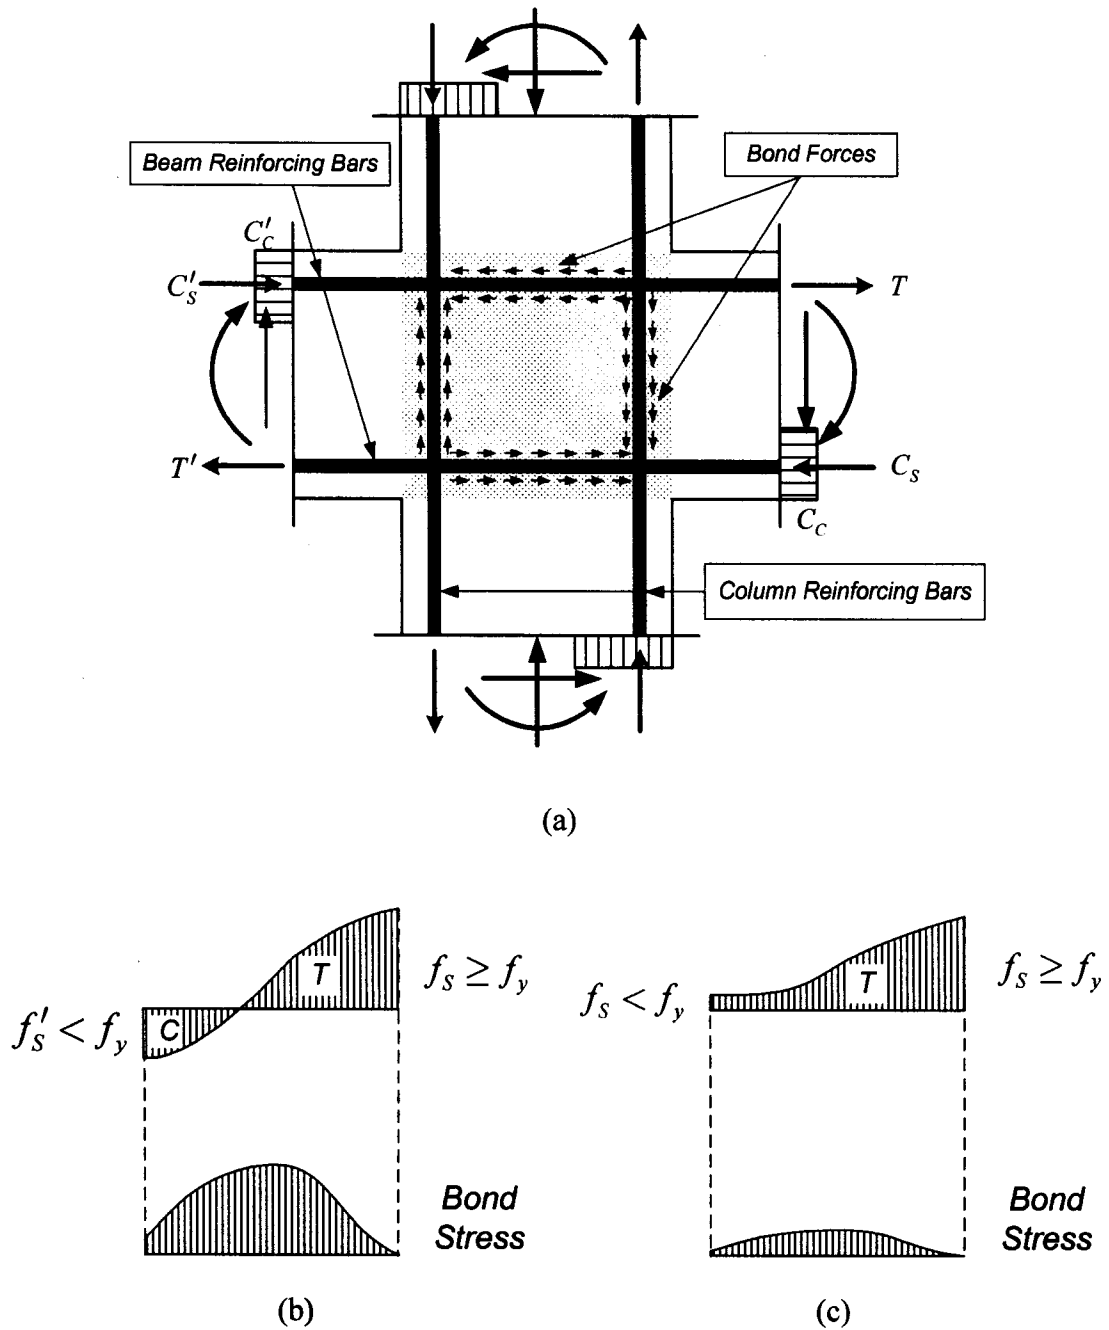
Bond forces in an interior beam-column joint subjected to lateral loads : (a) Internal forces in concrete and reinforcing bars; (b) Stress in top bars and bond stress distribution at minor bond deterioration; (c) Stress in top bars and bond stress distribution at significant bond deterioration
